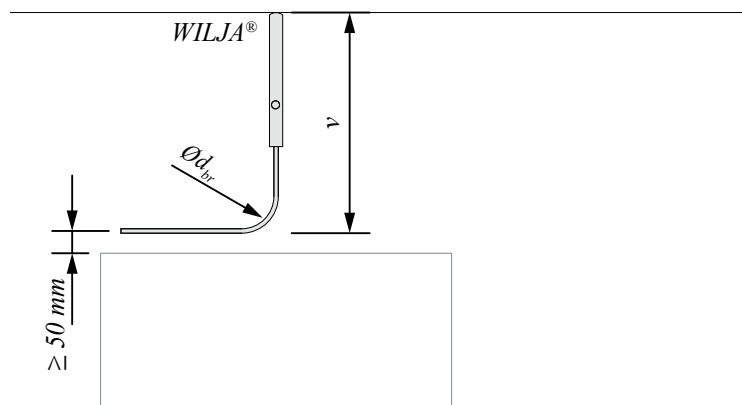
Installation over openings for WILJA® Lifting Inserts.
